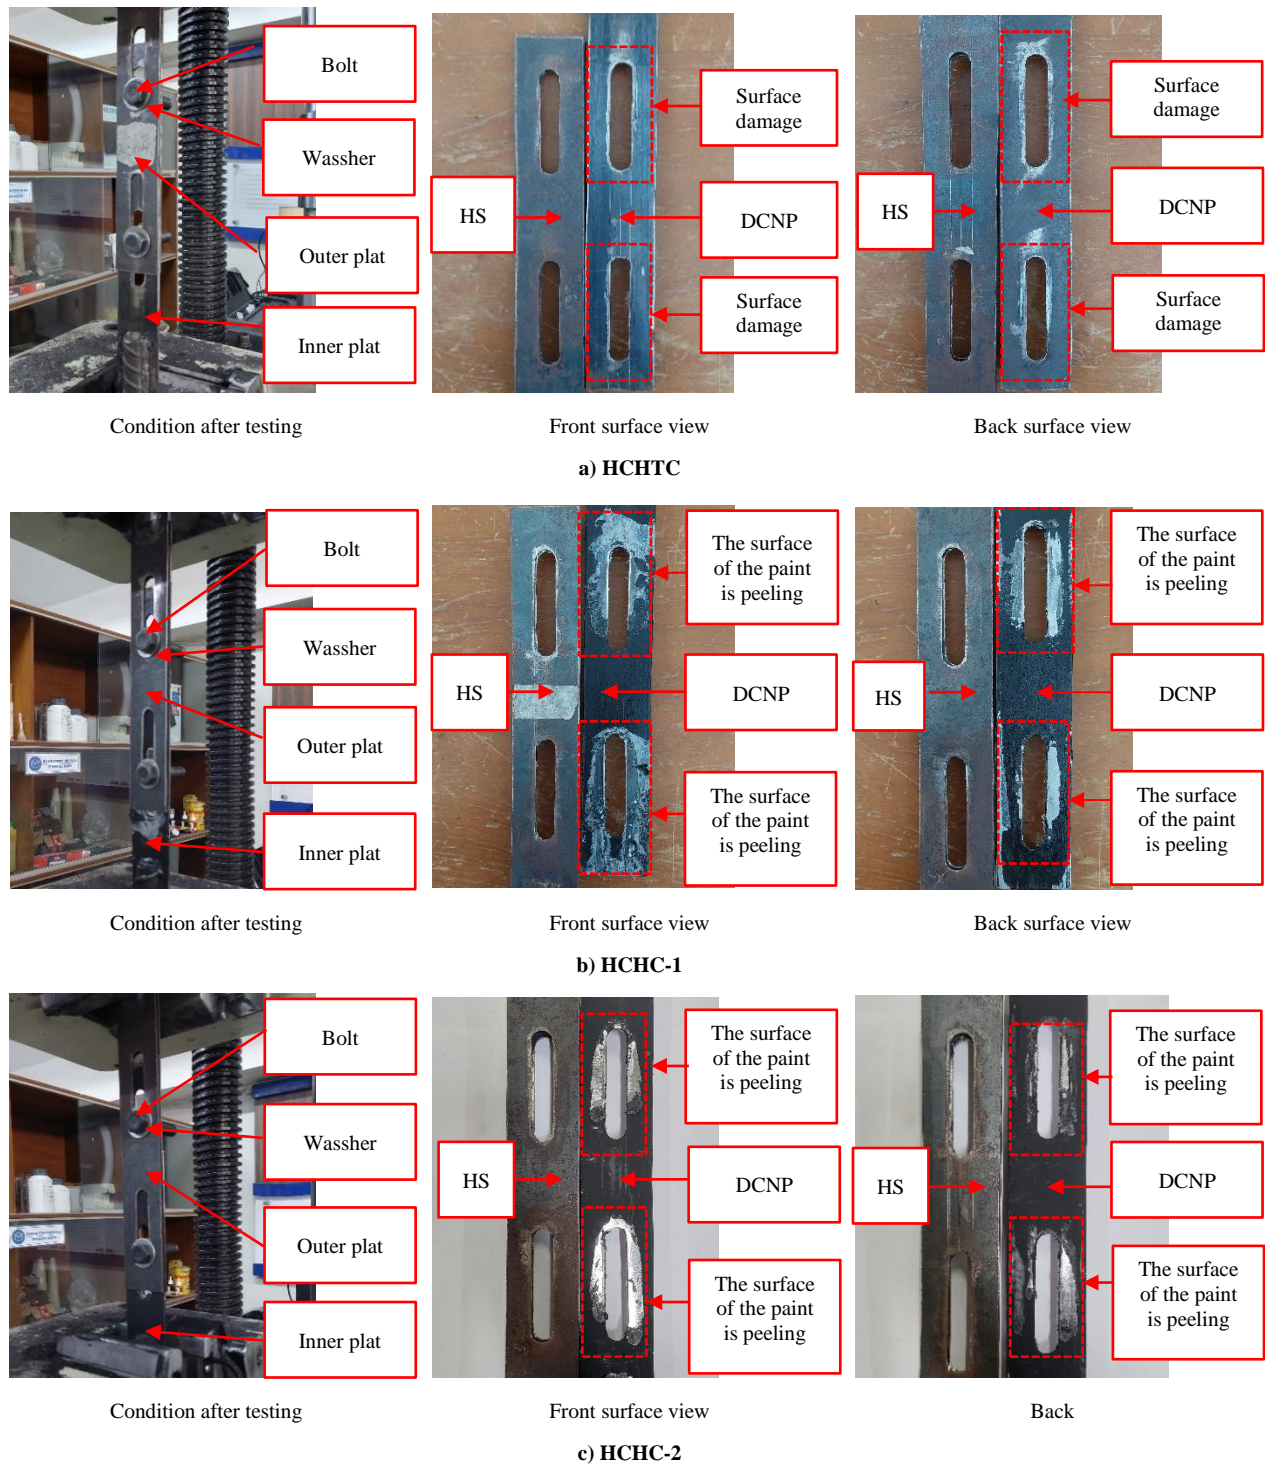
Conditions after the frictional tensile resistance testing of slip-resistant bolted joints
